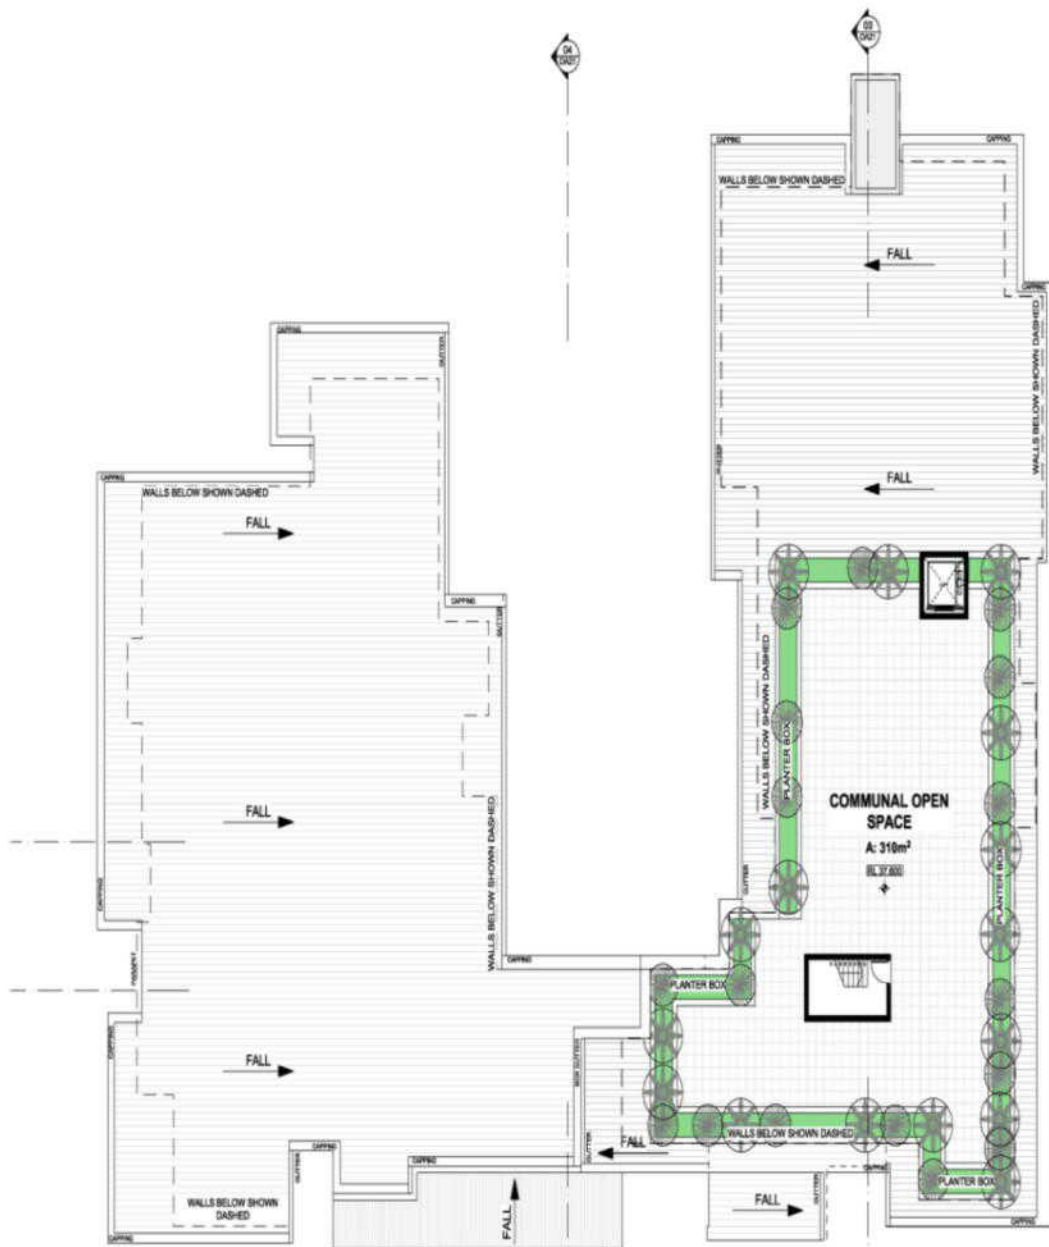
Roof plan. The portion of the roof on the right hand side fronting Wentworth Avenue exceeds the maximum height control. As evident from this plan, the portion is located on the elevation that results in the least physical impacts in terms of overshadowing and overlooking.
